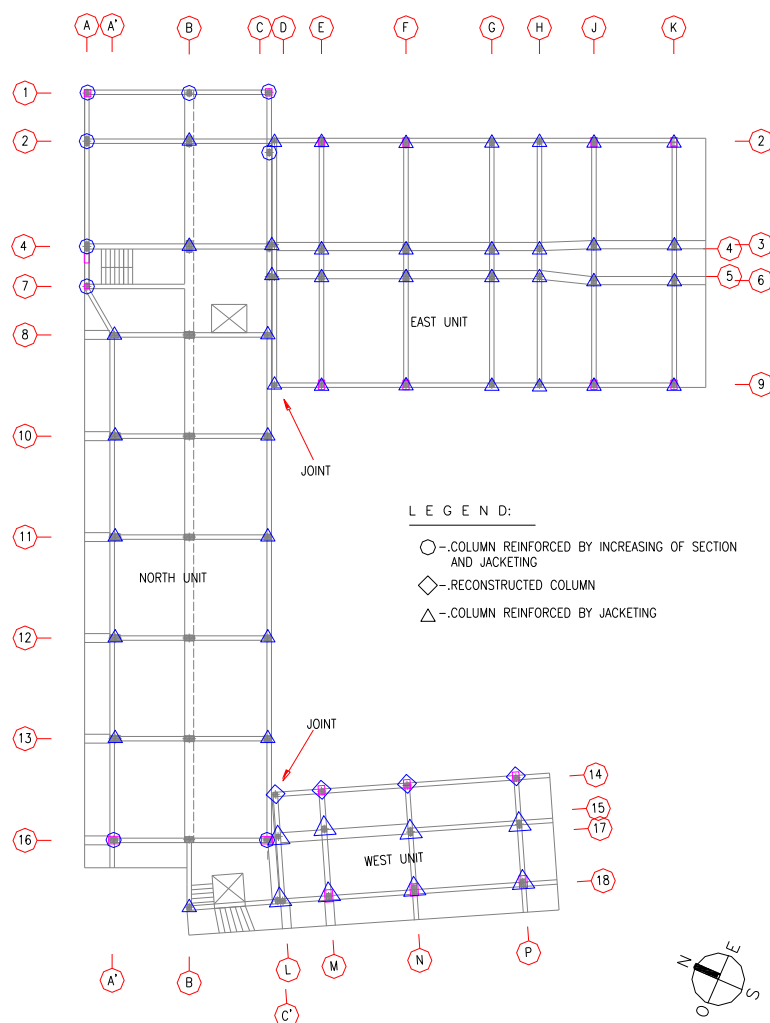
Plan configuration of Miramar Building. Column reinforced from Ground Floor to Level 1
